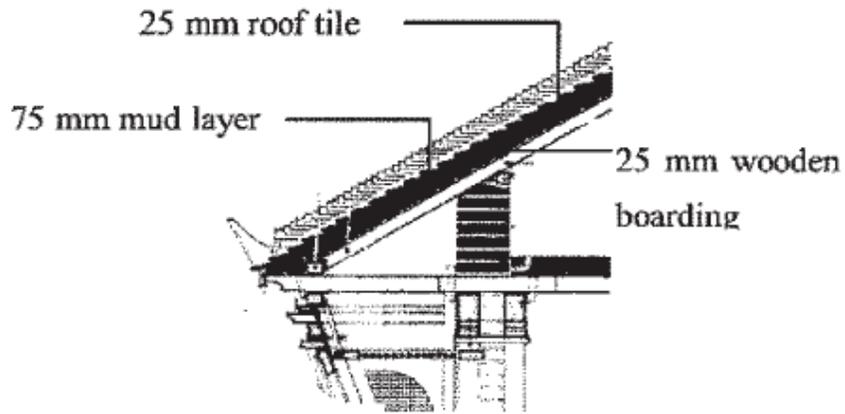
Roof Section of Traditional House (Source: Korn, 1986)
